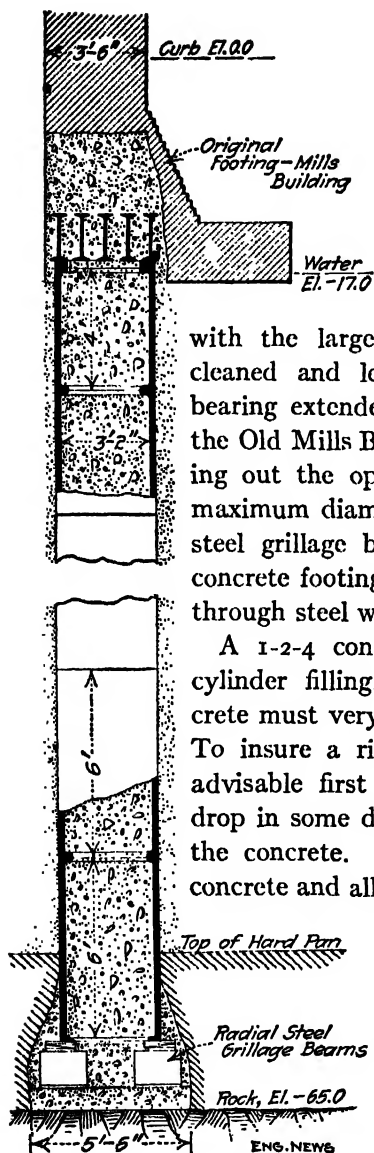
Typical Underpinning Cylinder for Mills Building, New York.
